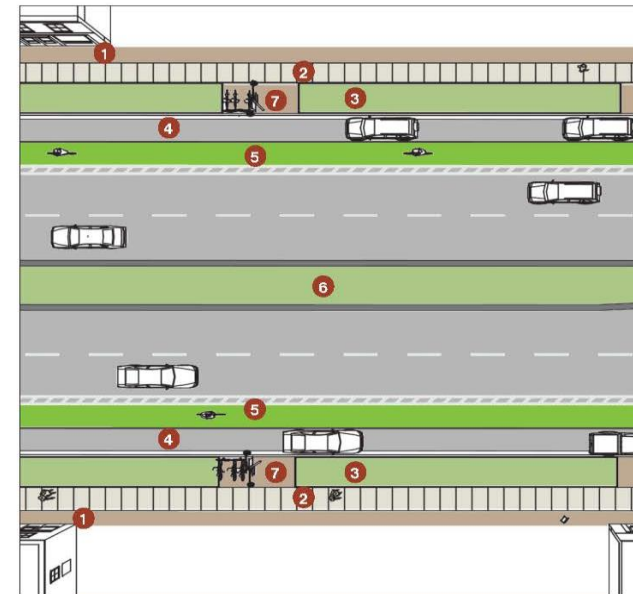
Chester Avenue 4th Street to SR-58 - Typical Plantings
